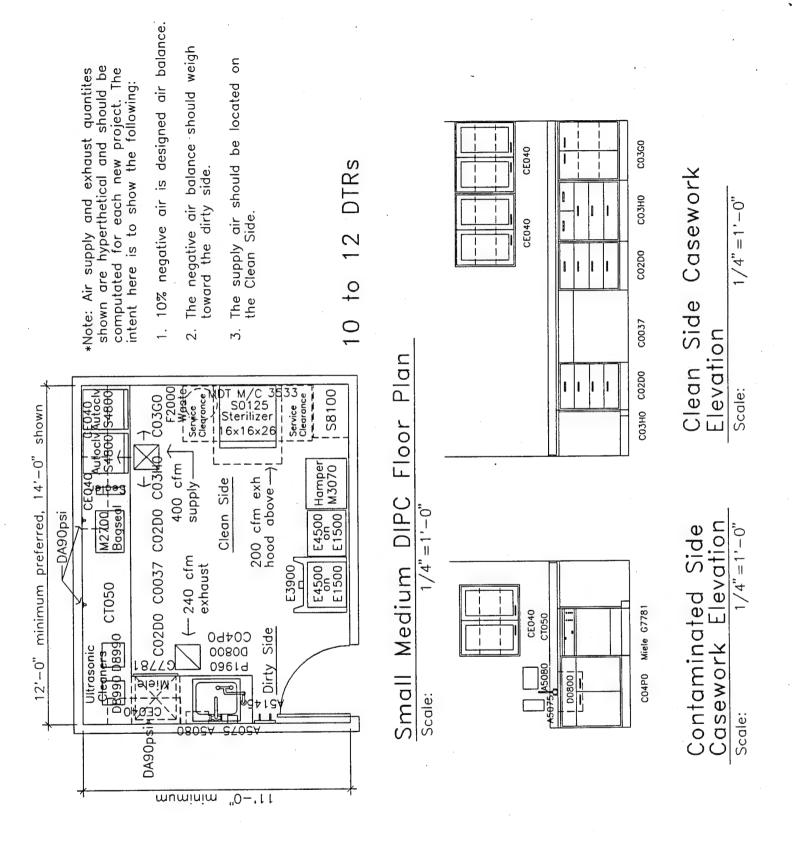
Small Medium Dental Instrument Processing Center Floor Plan 18
